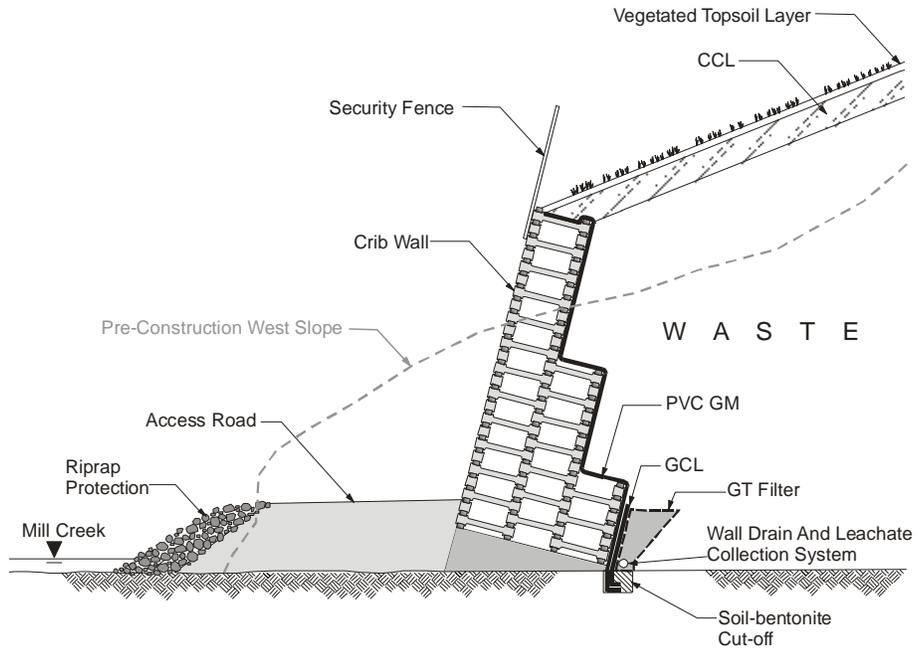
Pre-cast Concrete Crib Wall Used as Waste Buttress for a Sanitary Landfill (modified from Graves et al., 1998).
